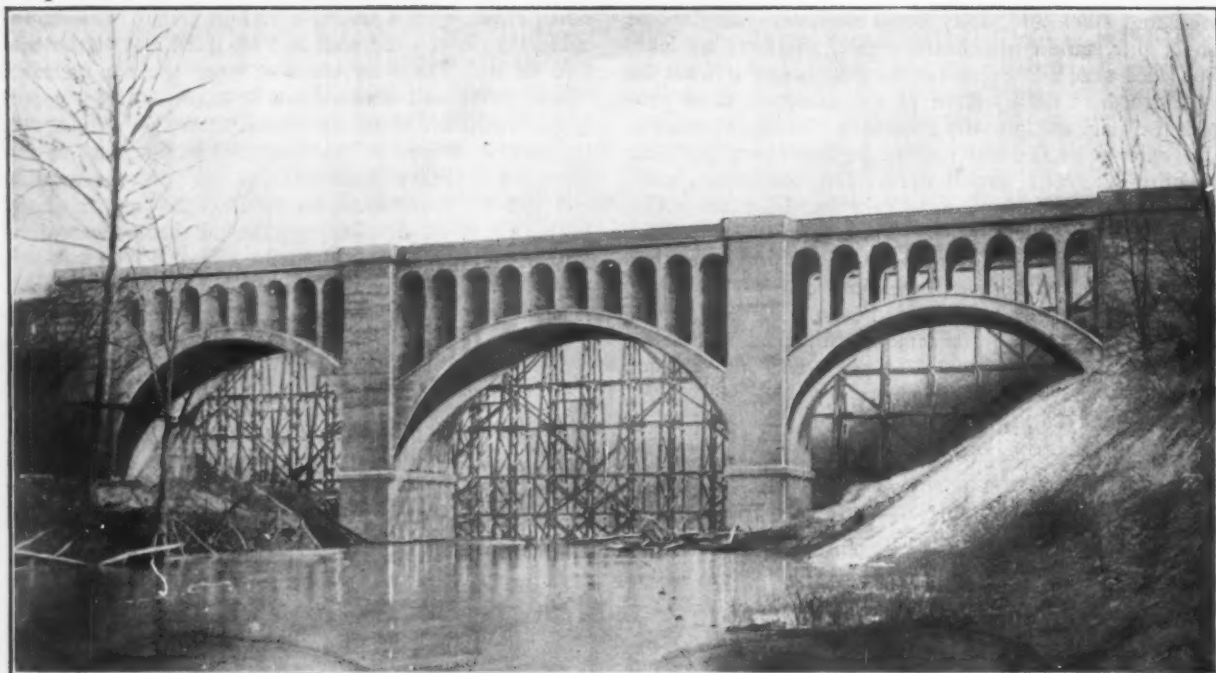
Reinforced Concrete Railroad Bridge Near Danville, Ill., Over the Vermillion River.
